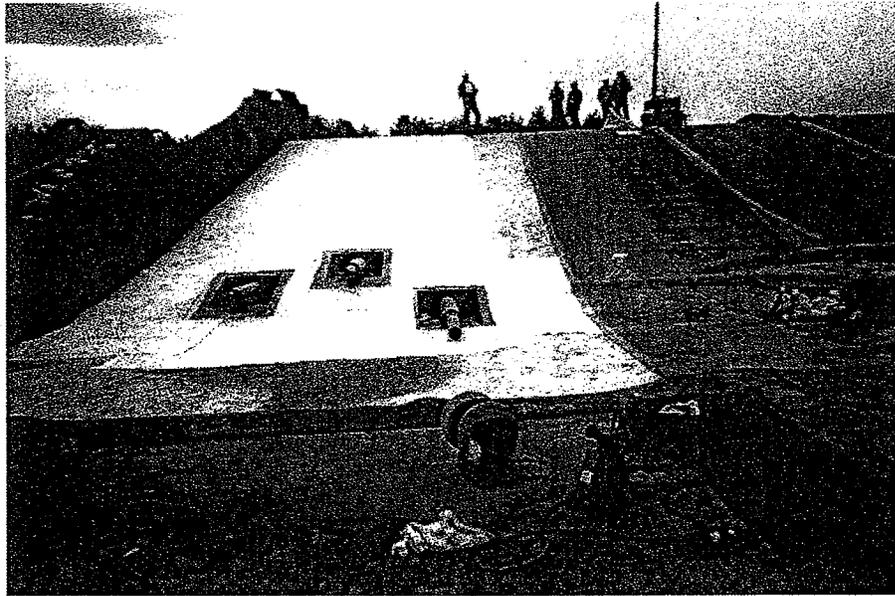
The geomembrane liner penetration boxes are installed and are ready to be welded to the geomembrane. The pipes at the left and center of the photograph drain the leachate collection system and will penetrate the primary geomembrane liner. The pipe at the right of the photograph drains the leak detection system and only penetrates the secondary geomembrane liner.
